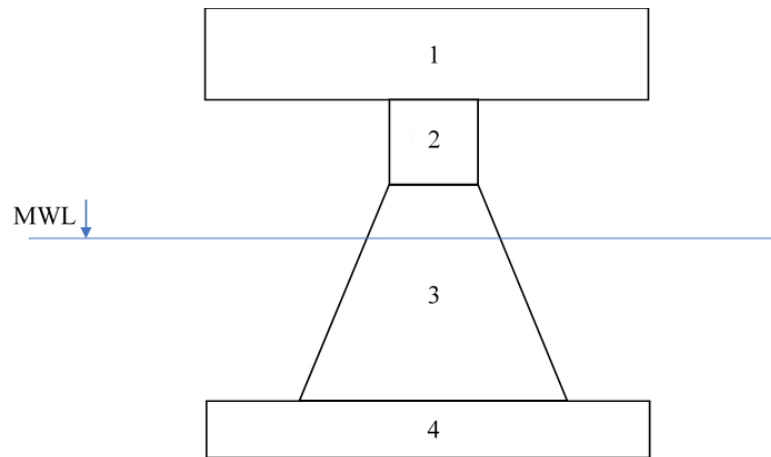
Monocone platform: 1 – top structure; 2 – column; 3 – cone; 4 – foundation.
